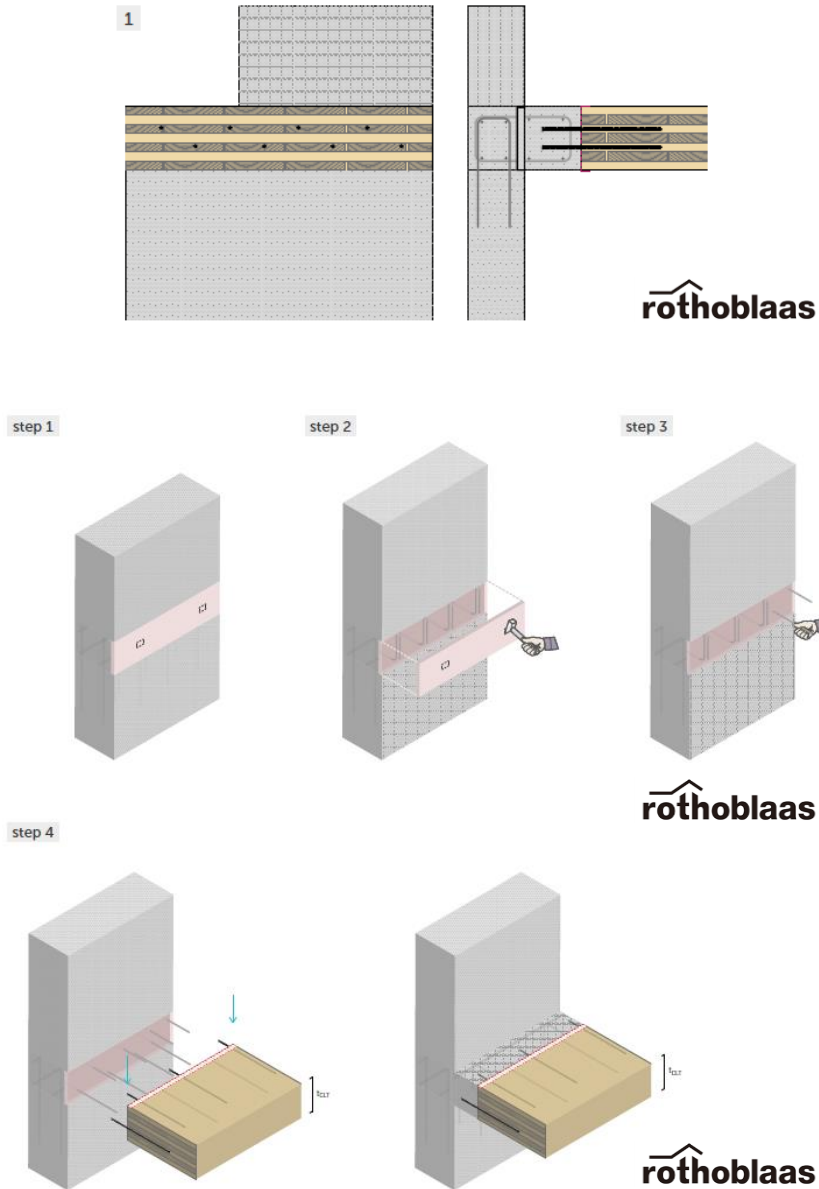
CLT slab to concrete wall connection and steps of installation (copyright Rothoblaas)
